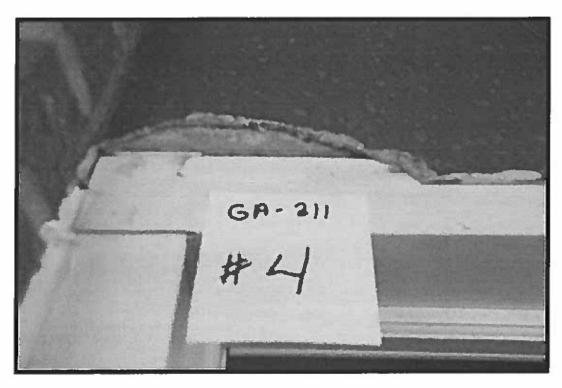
Sample GA - 311 - 4: Asbestos-containing cement wall panel (Transite board) in balcony of Suite 311. Typical of transite board found within balcony area of other Suites within the building. (30 % chrysotile)
